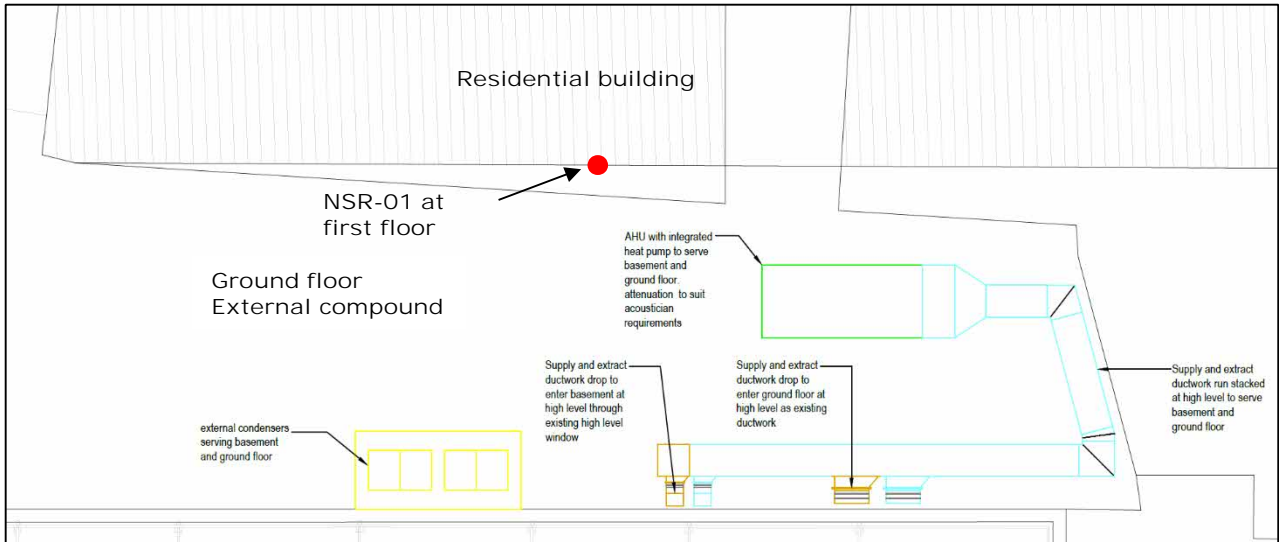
Locations of External Mechanical Services Equipment at ground floor level and NSR at first floor level
